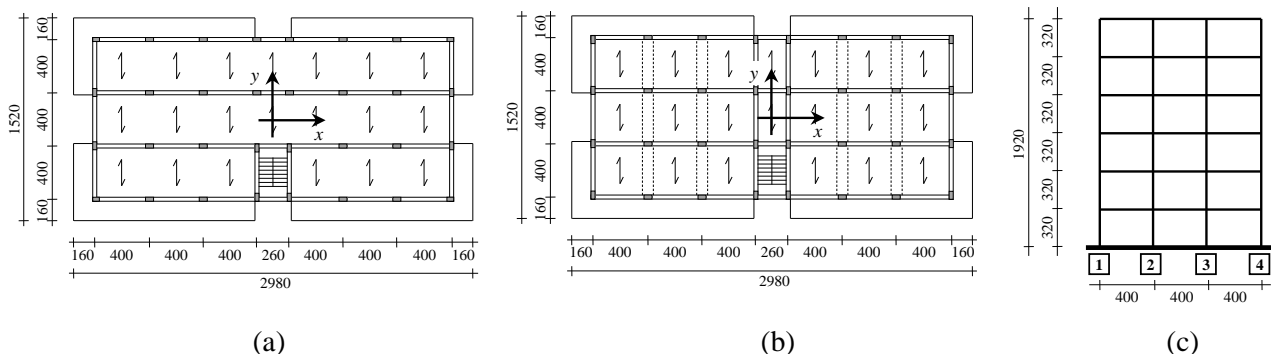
(a) Plan view of the GL buildings; (b) Plan view of the SR building; (c) Analyzed frame
